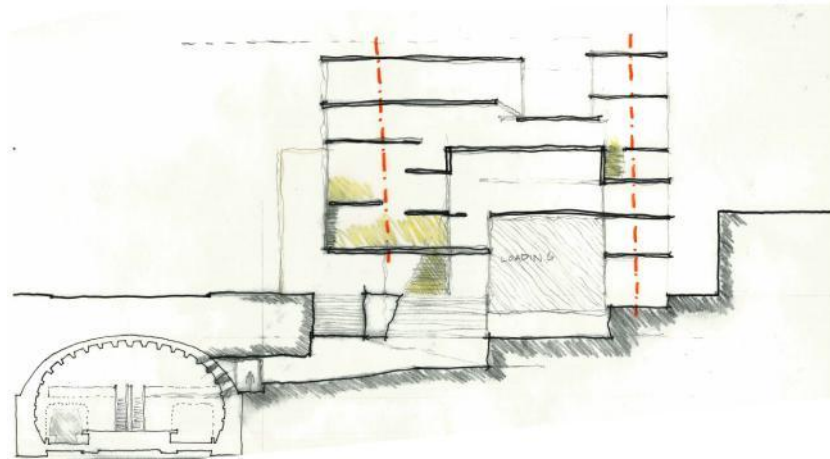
Section at Metro exposing tunnel to the street with a stair configuration
